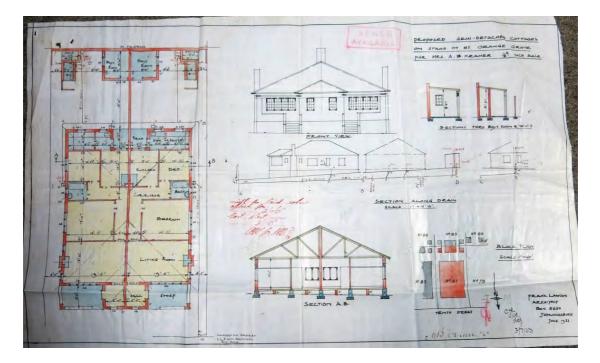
Plan for proposed semi-detached cottages, Stand 81 (Source: City Council of Johannesburg, Plans Archive)
